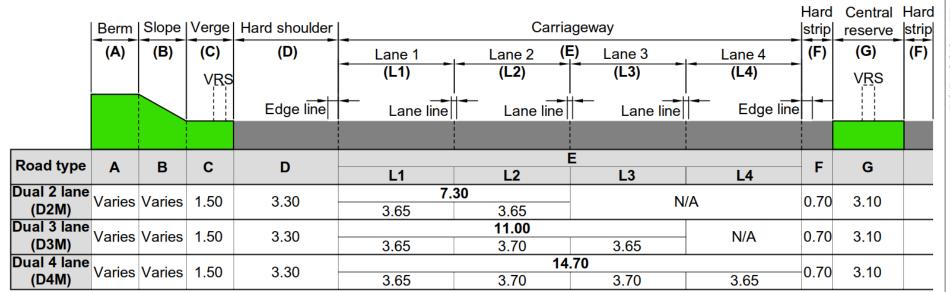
N1a Dimensions of cross-section components for rural motorway mainline
